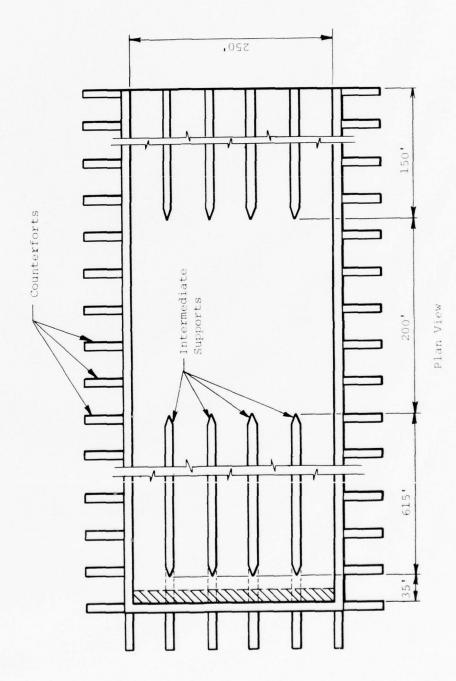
Long-Span Steel Joists - 250-Foot Span
